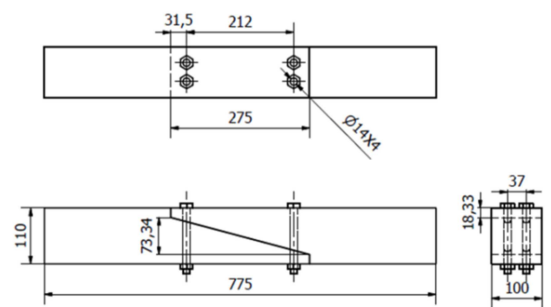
Design of Oblique Lip Joint with Bolt (B3)
